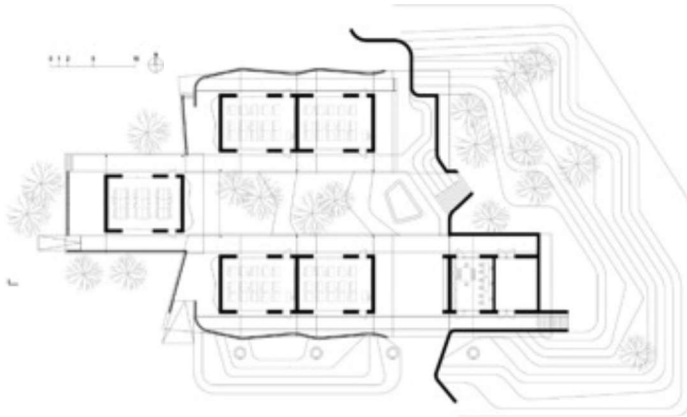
Ground floor plan of the Burkina Institute of Technology. The modular structures are arranged to form a central courtyard. © Kéré Architecture
